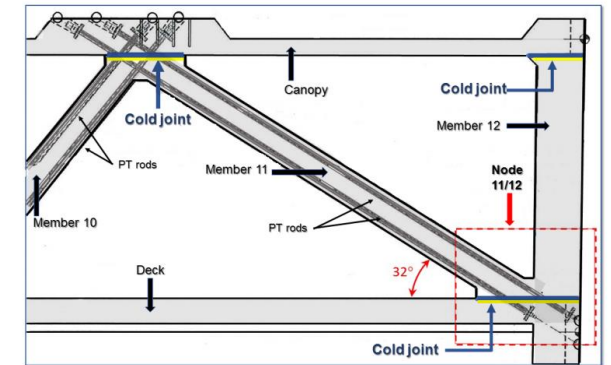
Cold joints on pedestrian bridge main span north end, at intersection of members 10, 11, and 12 at canopy and at node 11/12 connection to deck at pylon pier. [Note: View is looking west]
